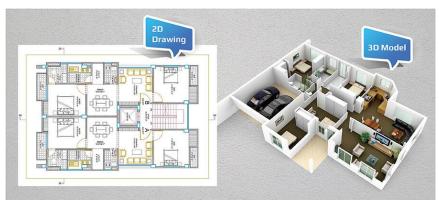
2D Floor Plan and 3D Floor Plan Visualization
